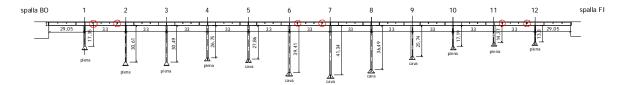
Geometry in elevation of the bridge, highlighting physically tested piers (Source: F. Paolacci)
